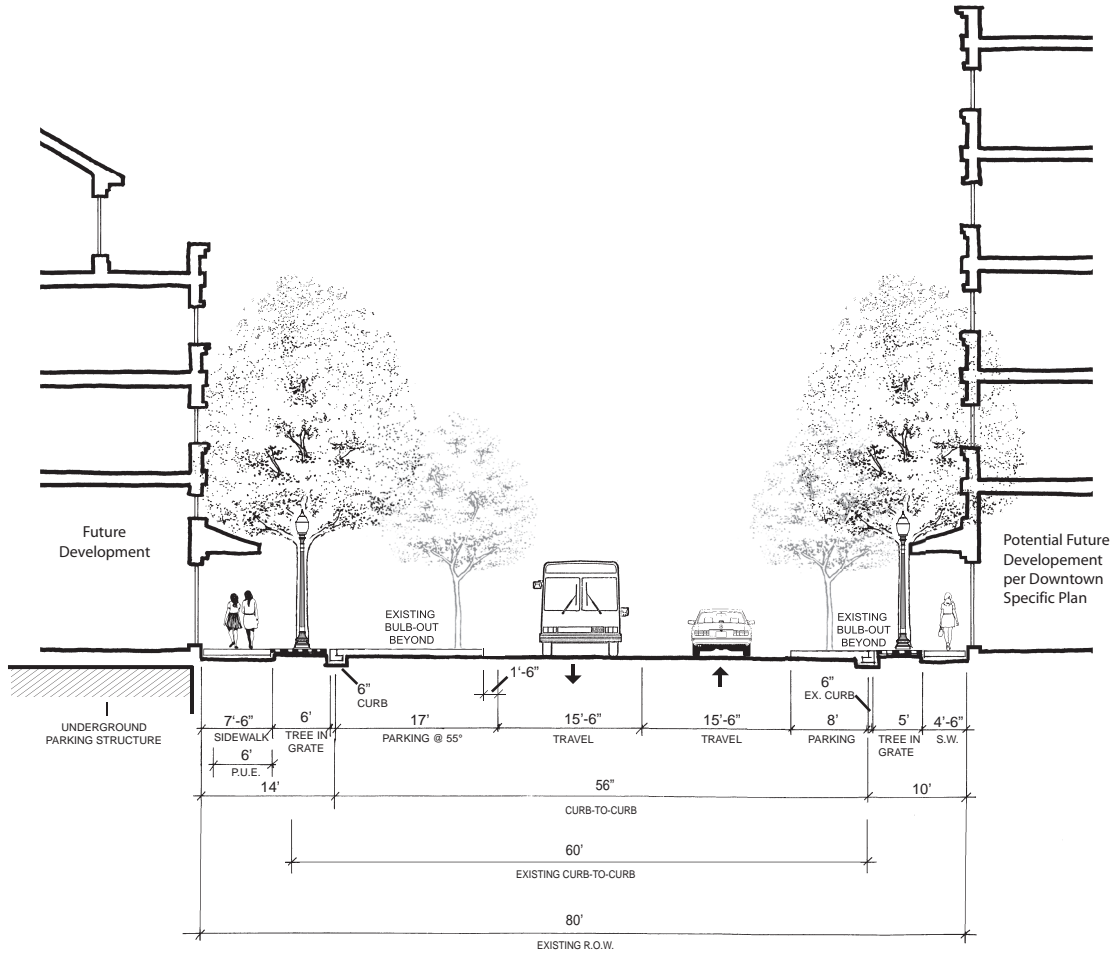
C.38: Santa Clara Street Cross Section (Option 3)
